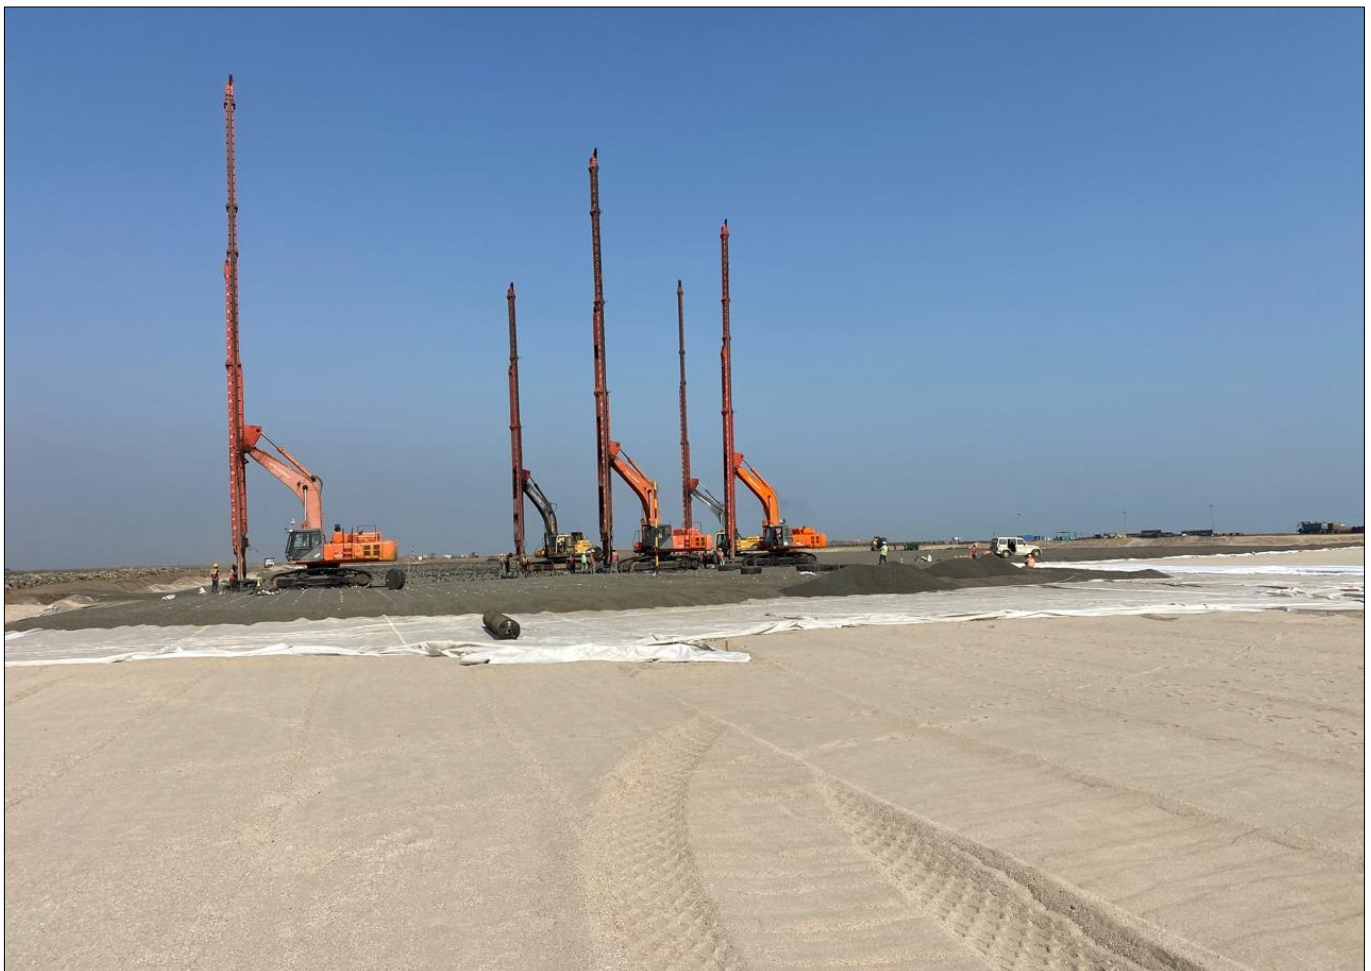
Geotextile Layer Installed and Covered with soil - Site Ready for PVD Installation
